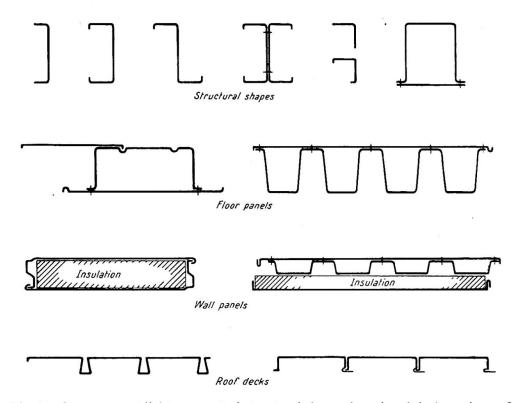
Some current light-gauge steel structural shapes (panel and deck sections of H. H. Robertson Co., Detroit Steel Products Co., and Truscon Steel Co.)
